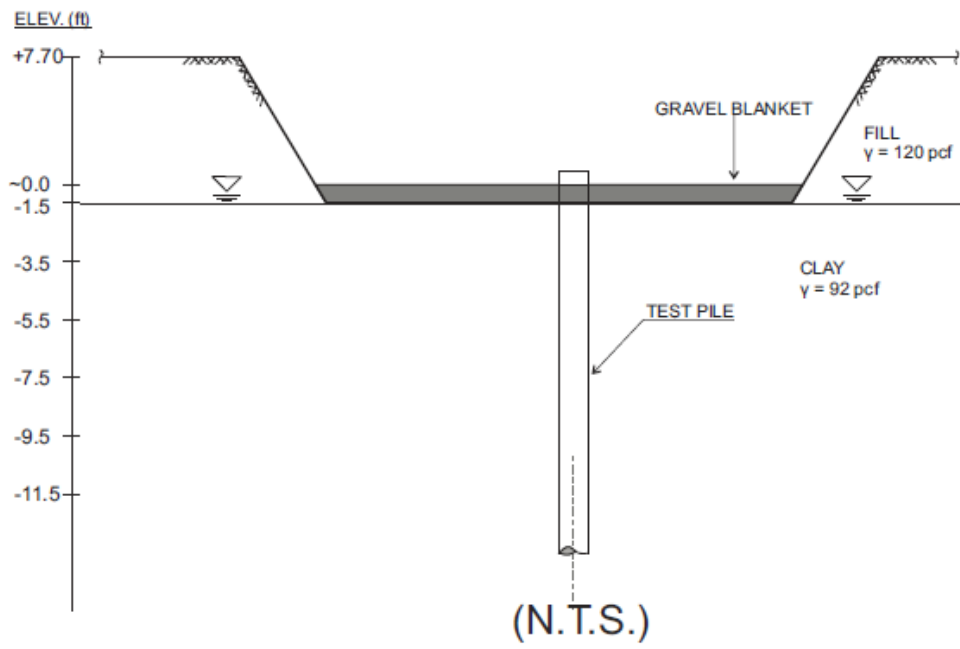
Schematic Cross Section of piles test pit at Site 2, Oakland
